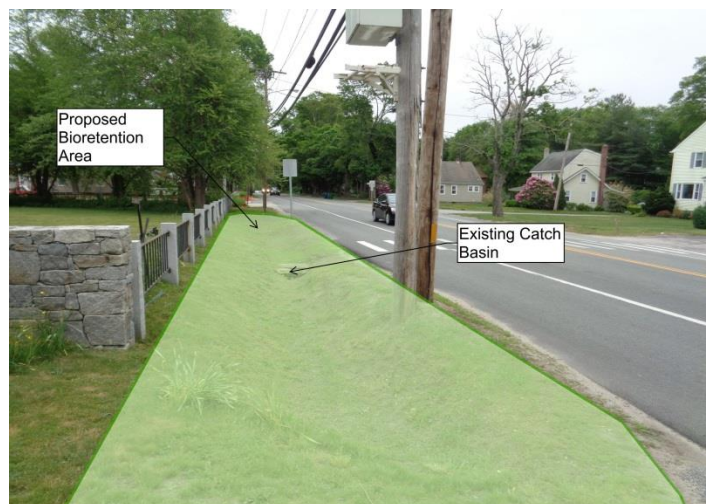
View of proposed bioretention area to be located on Kingstown Road, in front of the Courthouse Center for the Arts in South Kingstown, RI.
